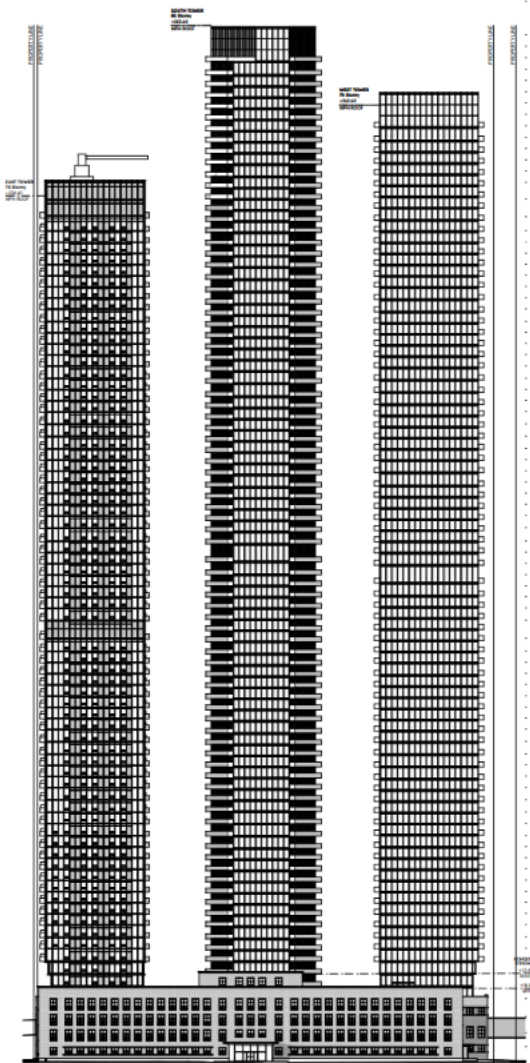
North elevation drawing included for illustration purposes (architectsAlliance, February 14, 2026).
